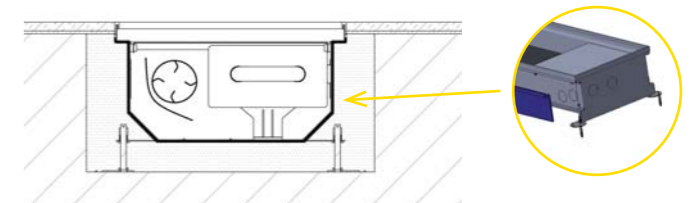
Solid floor - thermal insulation for floor convector with fan to protect the floor on the exchanger side.
